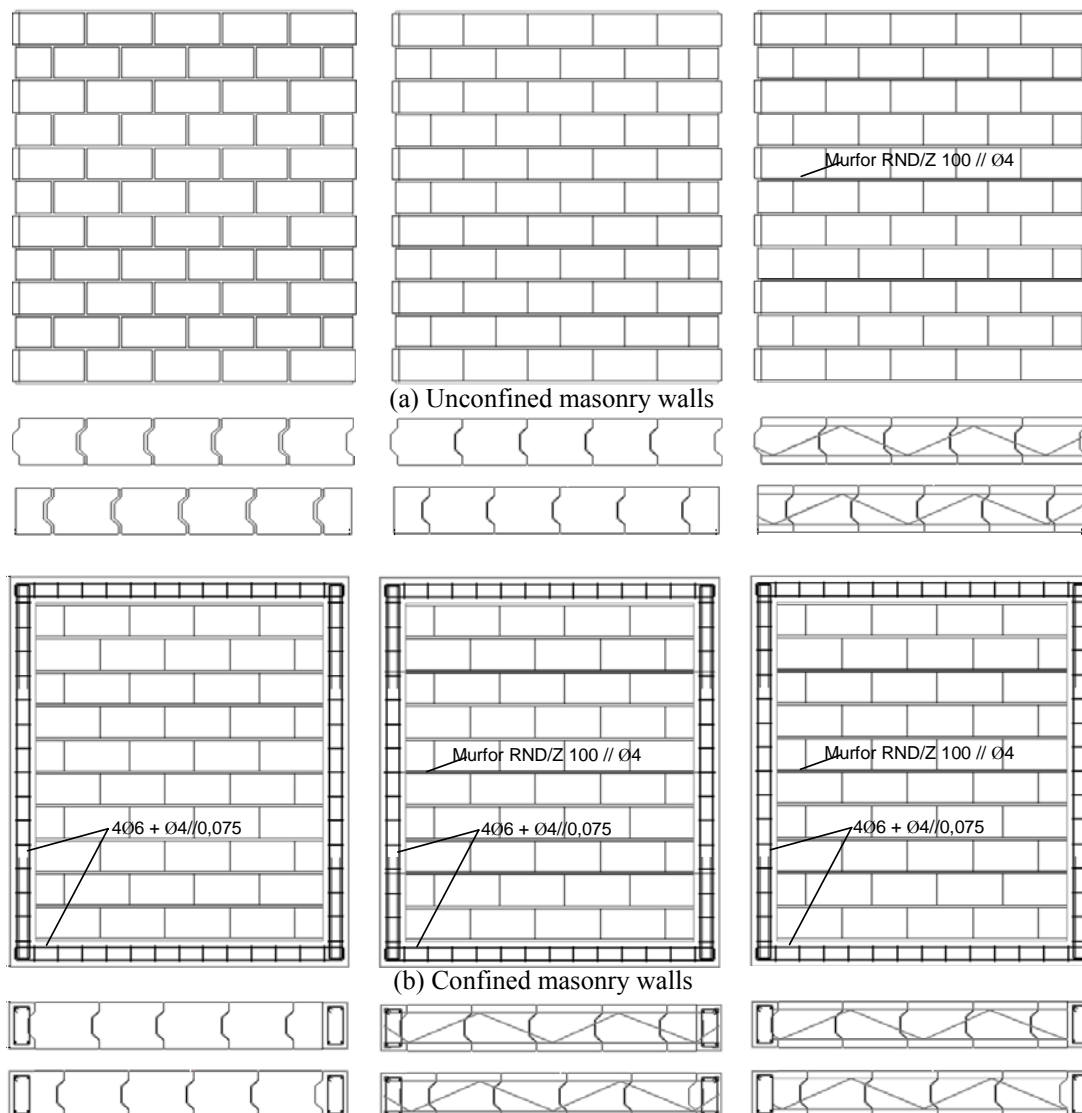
Lightweight concrete masonry walls; (a) unconfined walls; (b) confined walls
